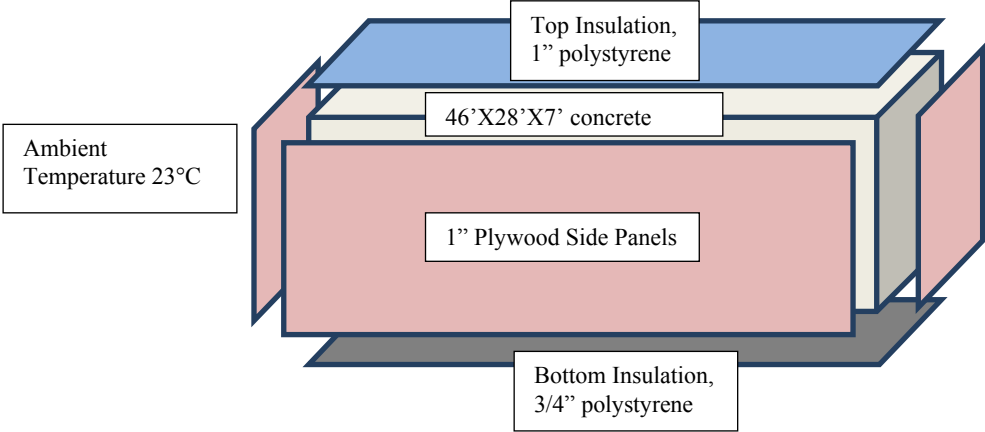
Mass concrete block, plywood panels, bottom and top insulation.
